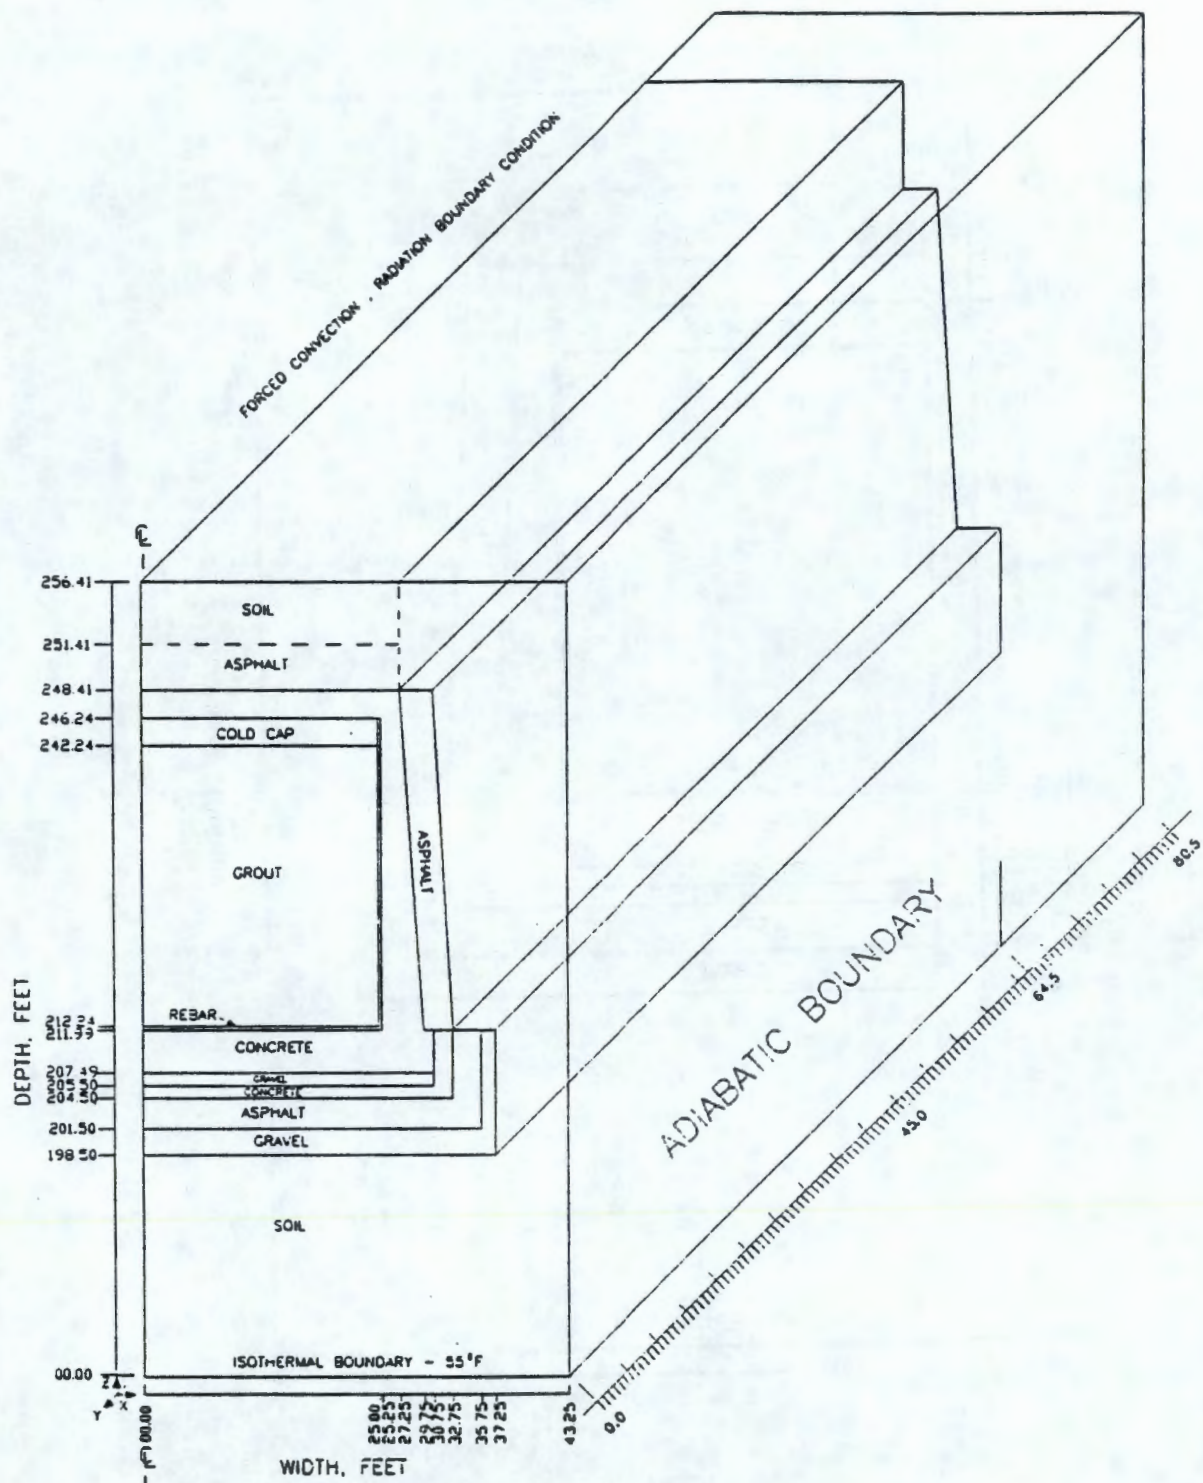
Asphalt Barrier Grout Vault, 3-Dimensional Model.
